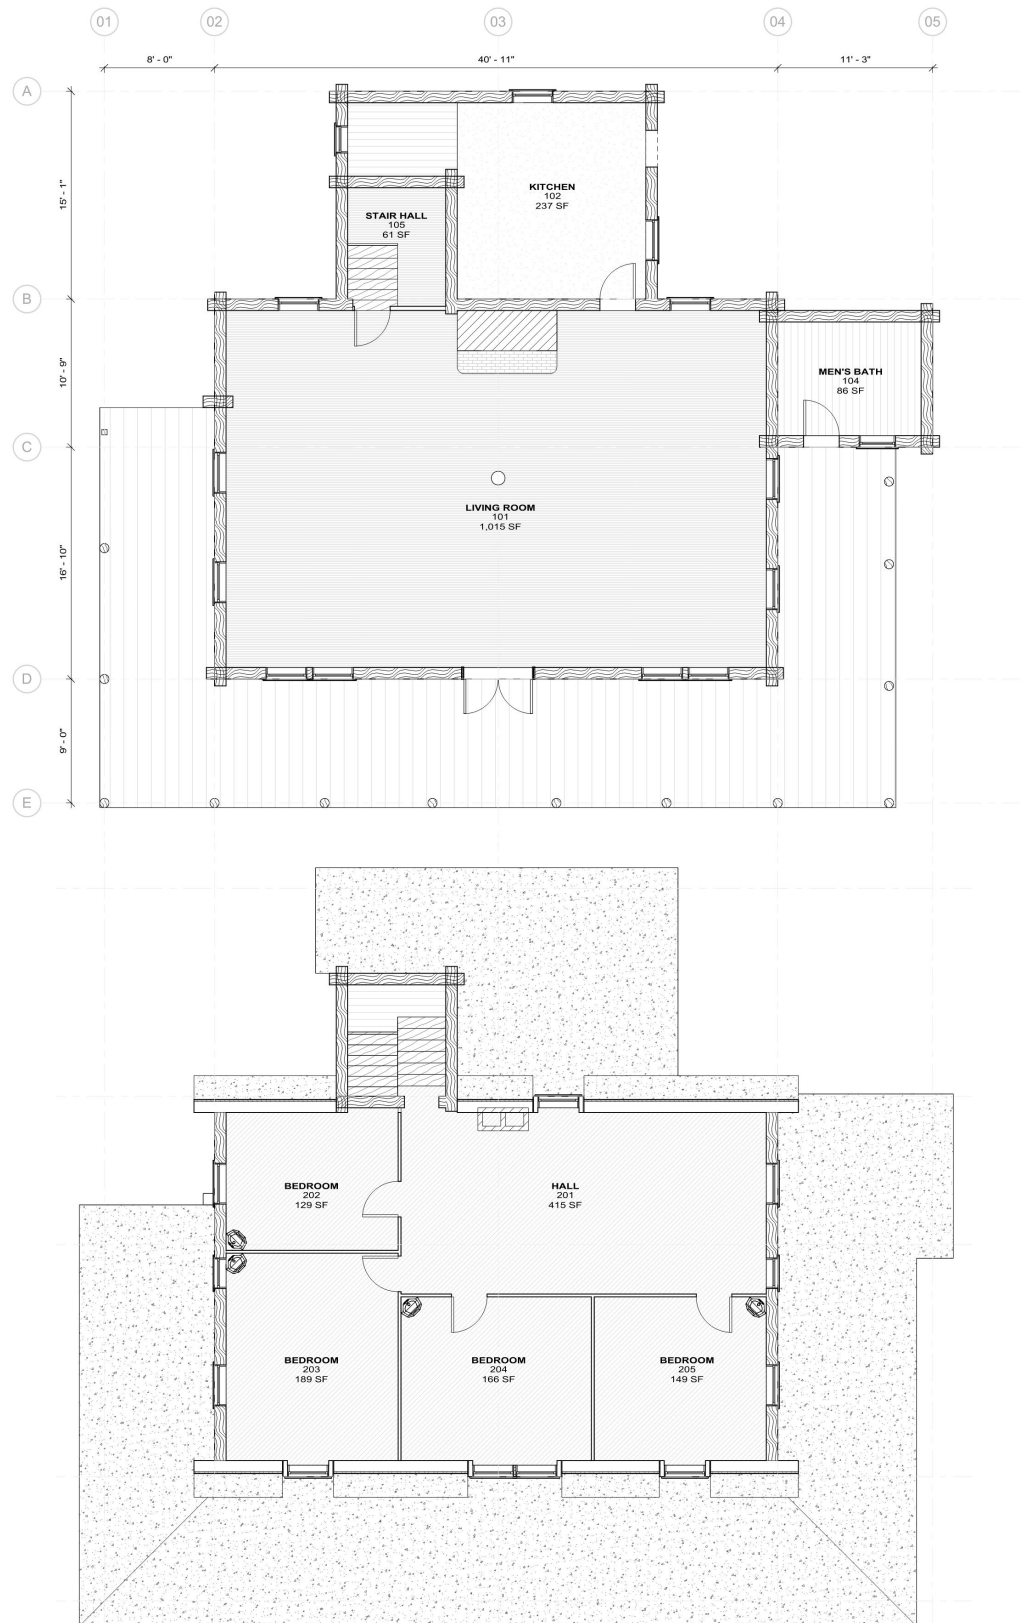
Lodge First (above) and Second (below) Floors Existing Conditions Sketch Plans, not to scale. (AH, 2022)
